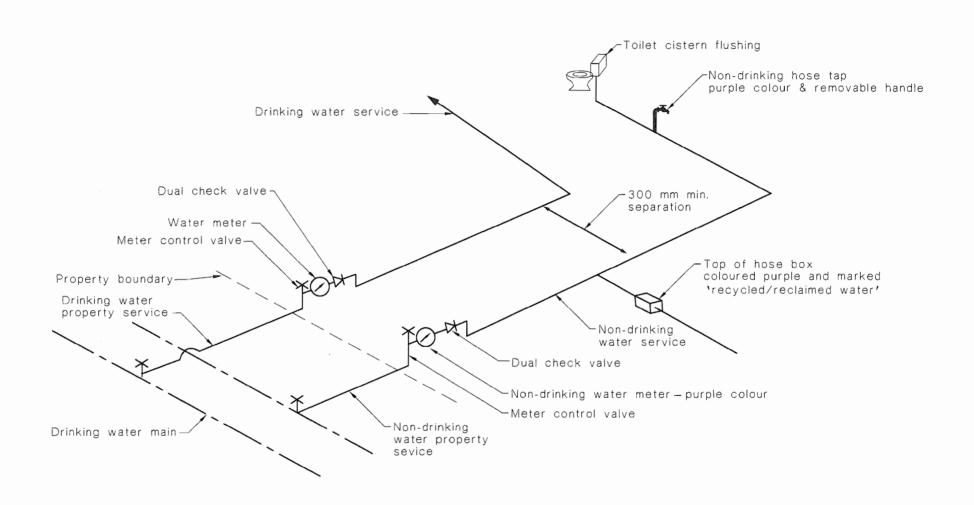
TYPICAL NON-DRINKING WATER INSTALLATION FROM A RETICULATED RECYCLED WATER SYSTEM
